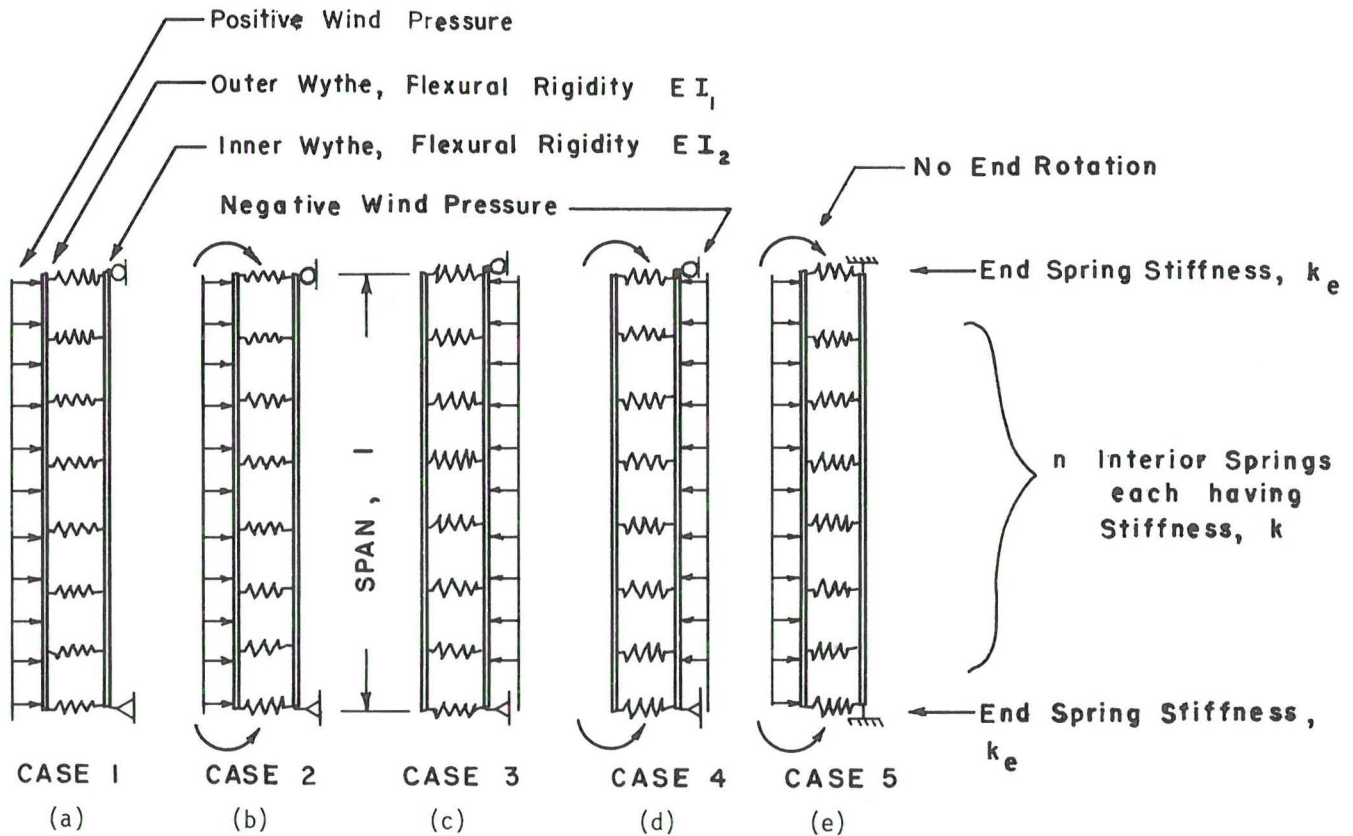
Cavity Wall Configurations with Various Loadings and Boundary Conditions
